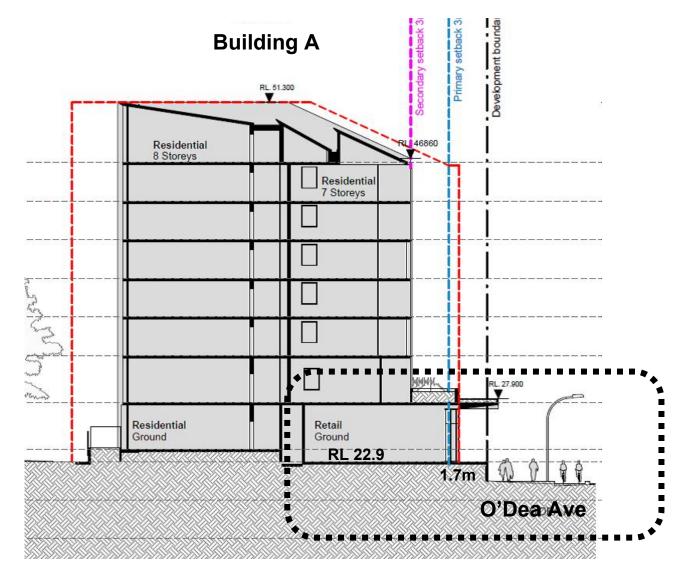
Section through Building A illustrating the difference of level between the retail tenancy and the adjoining O'Dea Avenue footpath.
